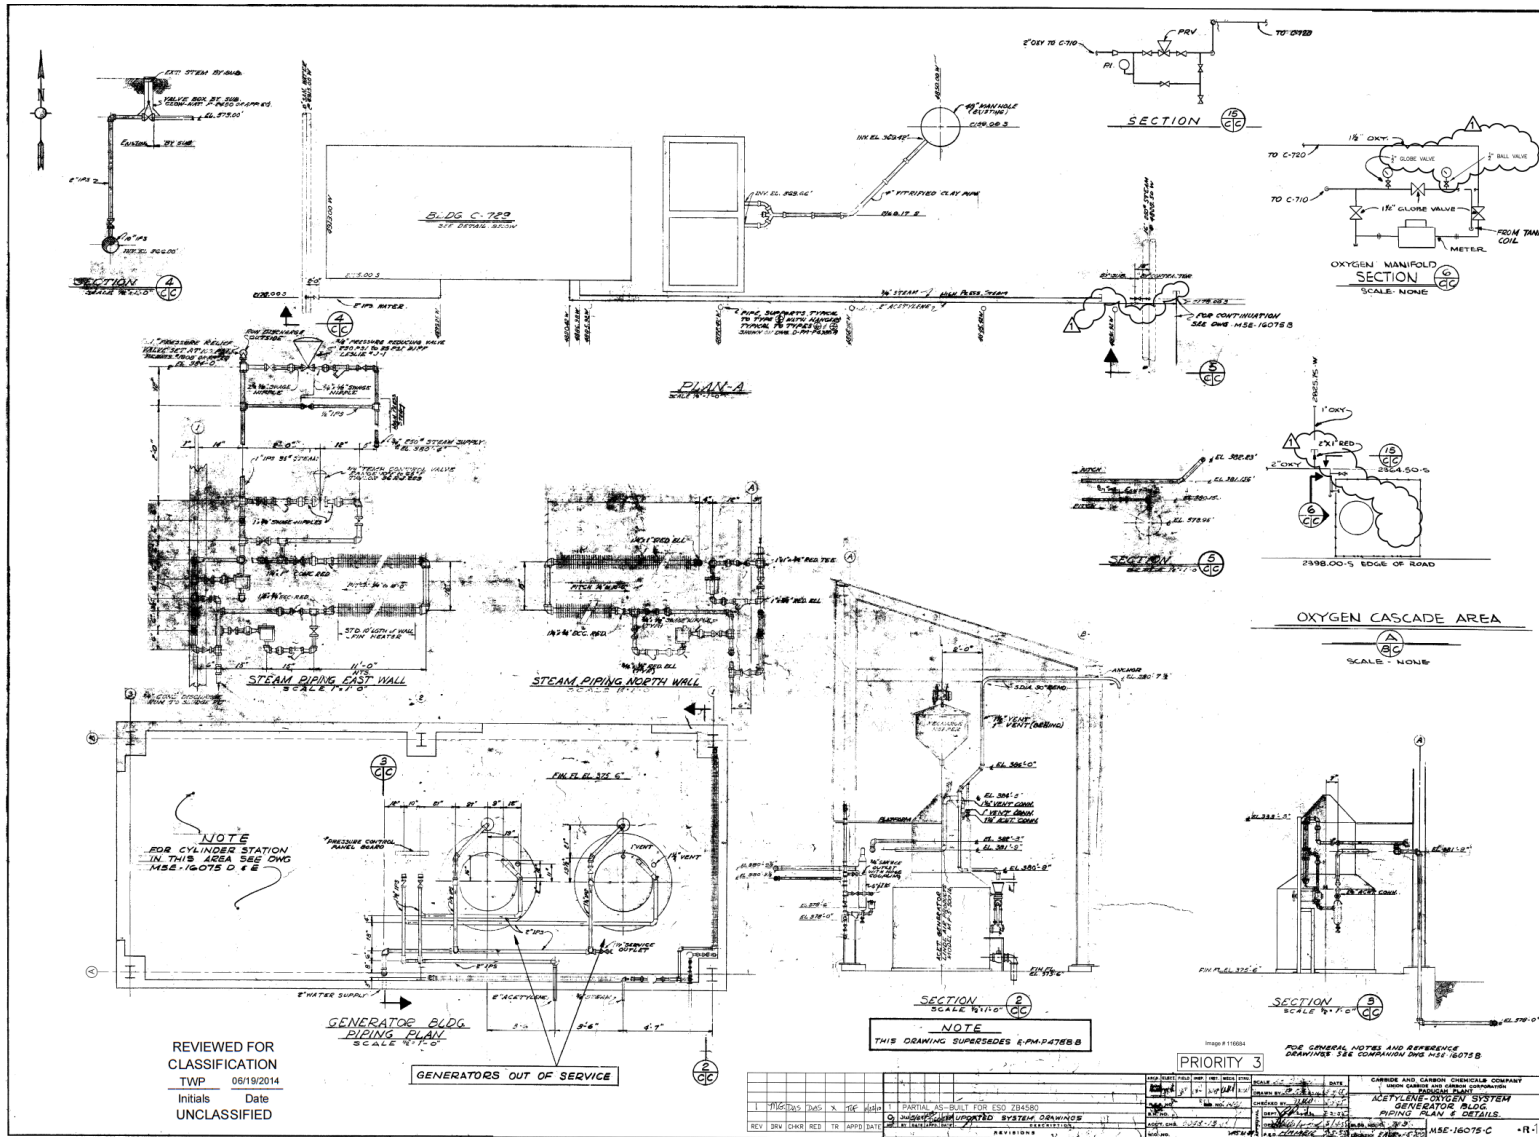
Engineering Drawing M5E-16075-C, Rev. 1
